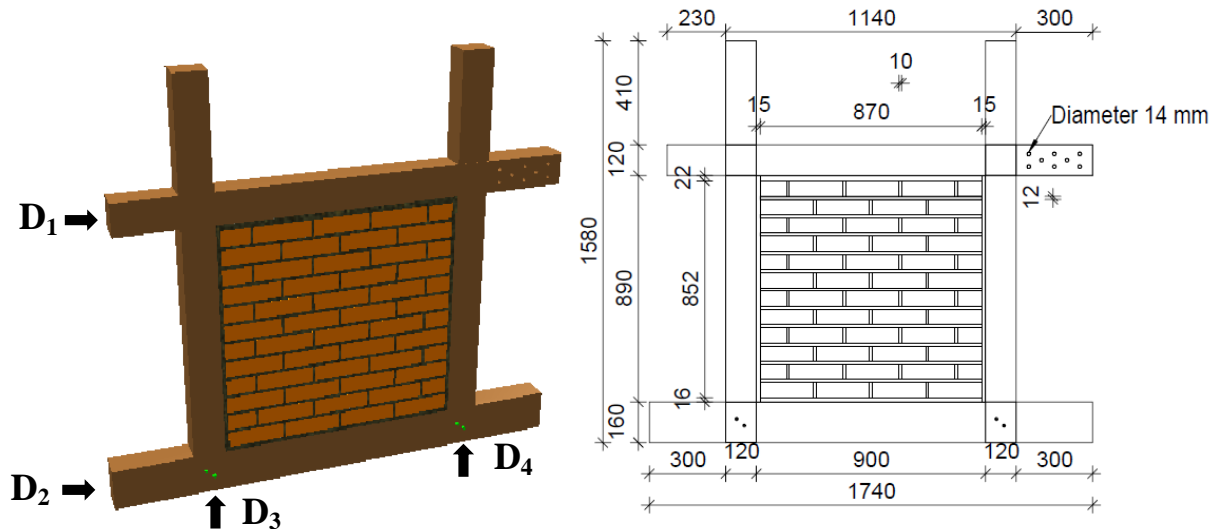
TFM-CH specimen layout (left) and dimensions (right)
